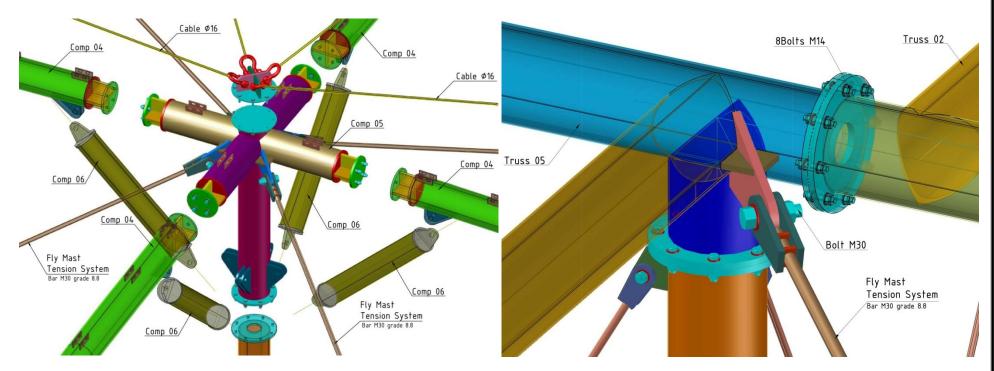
The above image shows the column detail and connection to the arches in center part of the structure, and also shows how fly mast tension systems and safety cables connect to the center column
